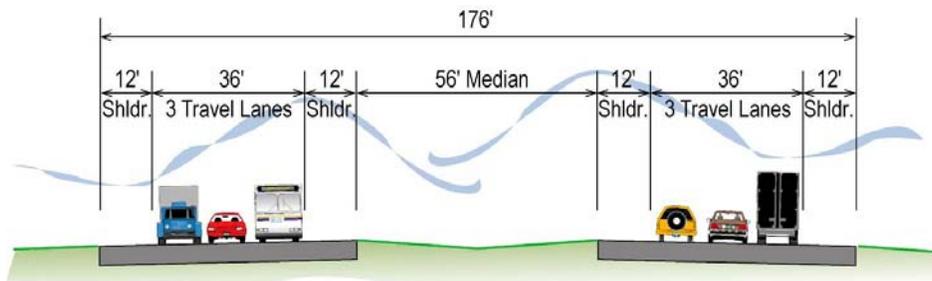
Package A Typical I-25 Cross Section - Crossroads Boulevard to SH 60
